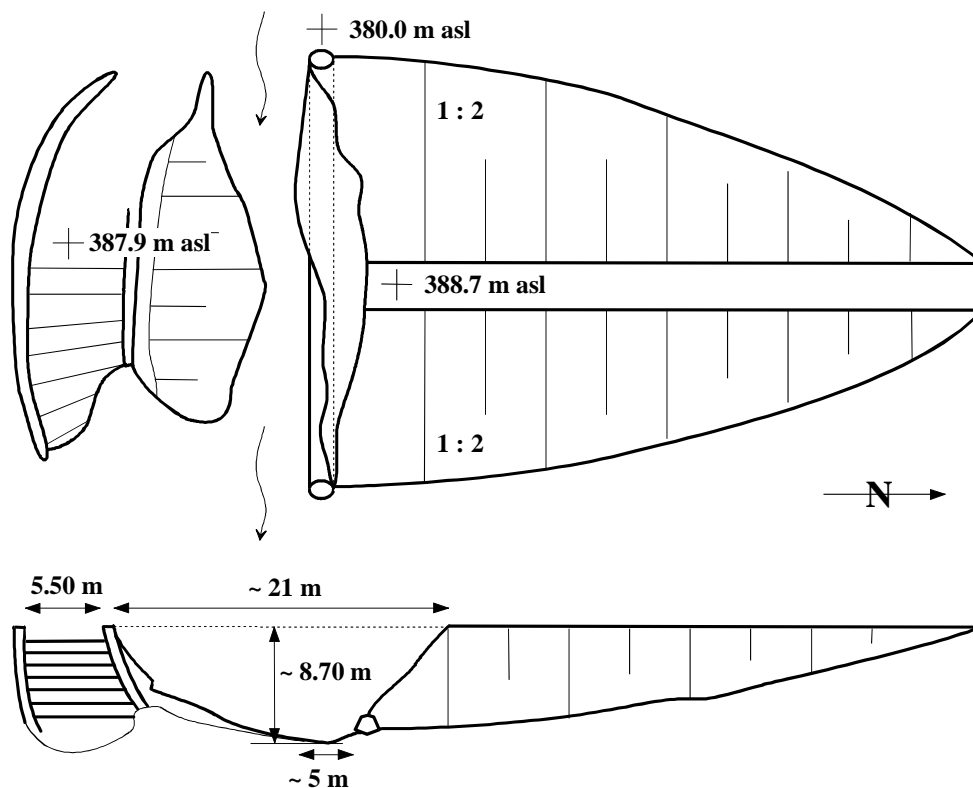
Glashütte embankment dam in plan (top) and downstream elevation (bottom).
